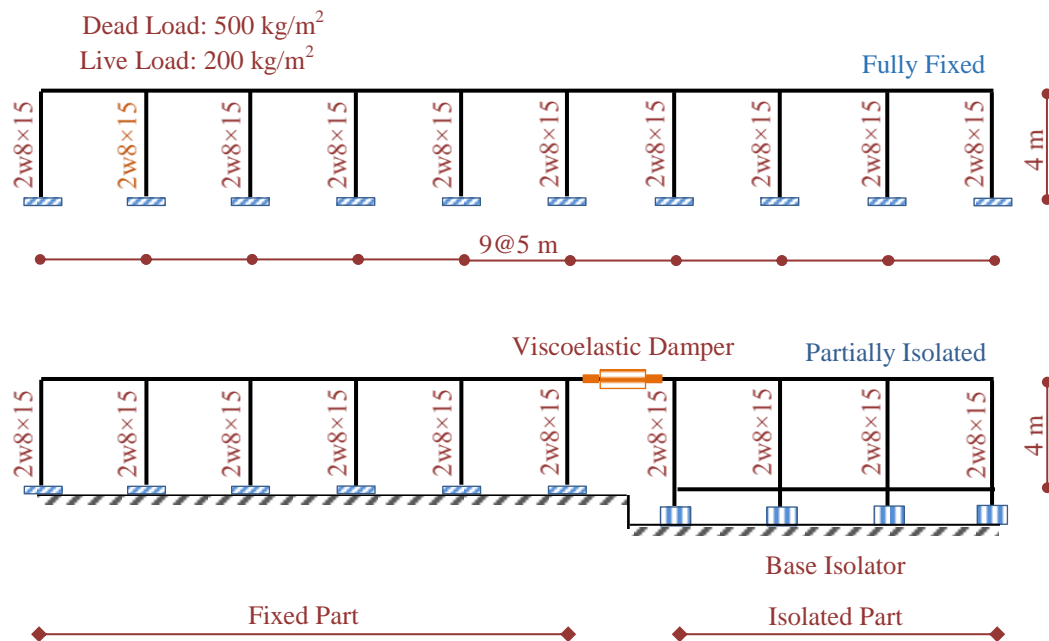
Single-story structure with 10 columns under the condition of FF and PI.
